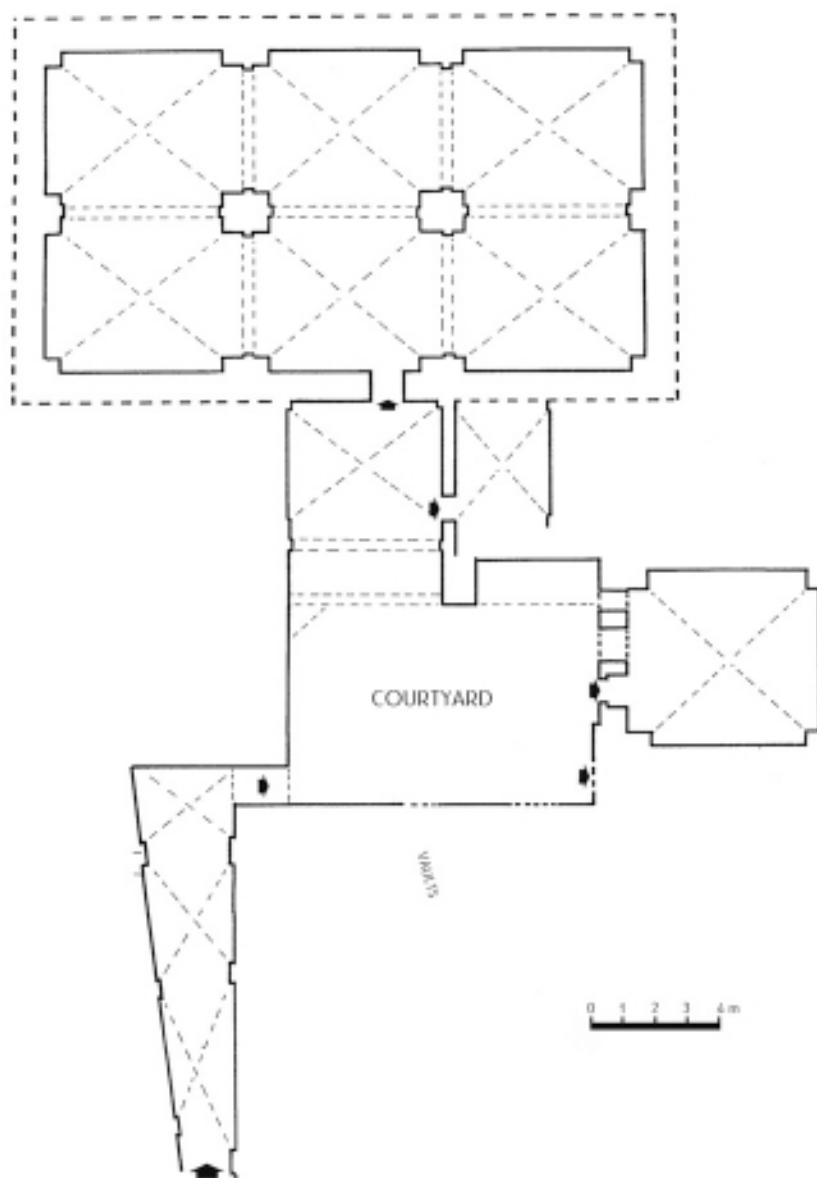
Plan of houses around communal courtyard in Genoese quarter, Acre (House 1:17) (drawing by author).
